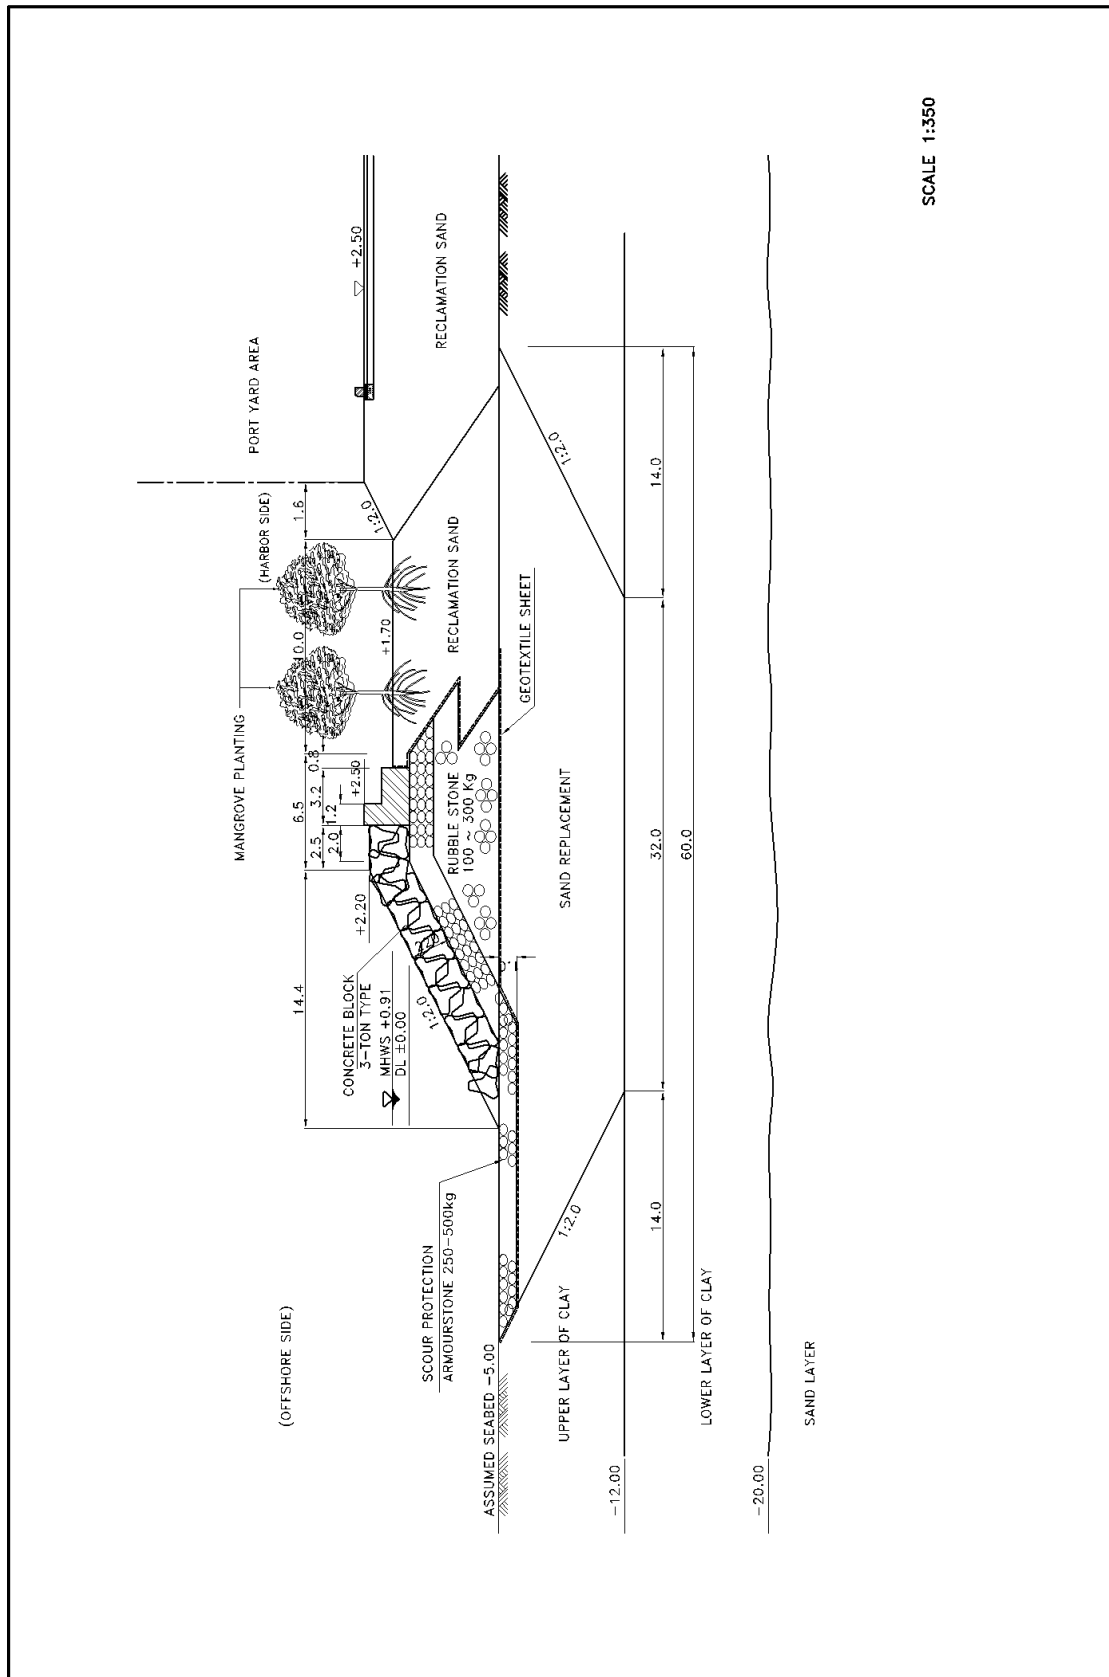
F-12 Typical Section of Revetment for Ancol Reclamation (Offshore side; with Mangrove Planting)
